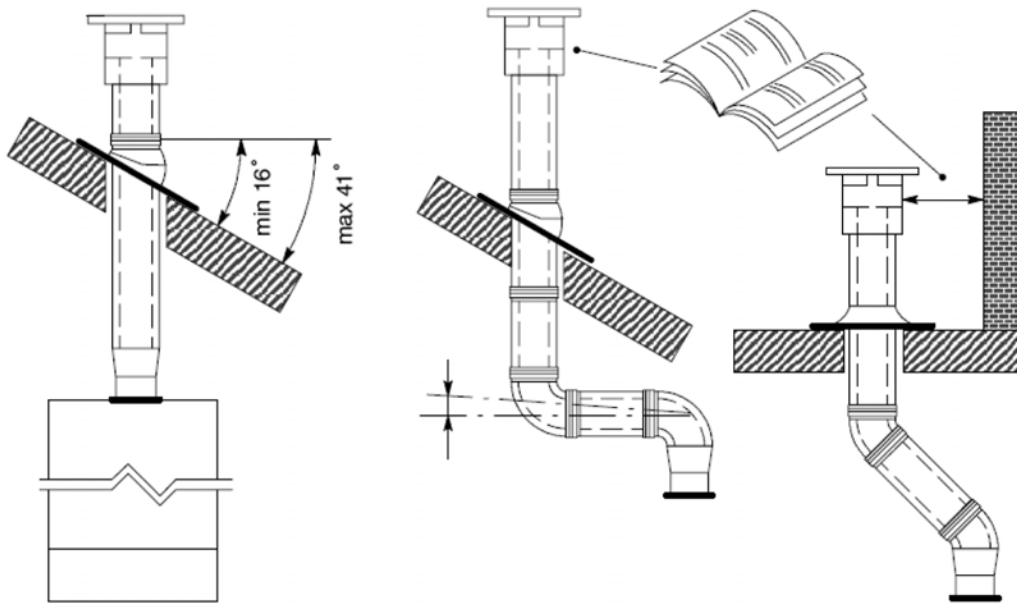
(vertical pipe Ø 3.1 / Ø 4.9 in)
